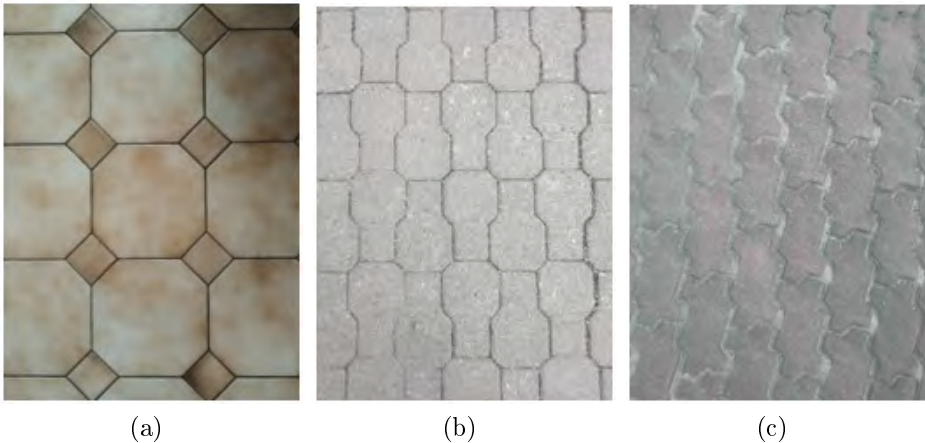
Examples of practical solutions in floor and pavement design, photo by E. Koźniewski: (a) floor tiles—styling of semi-regular tessellation  $x-y-z$ ; (b) parking lot paving –paver blocks "mirror", sidewalk designed according to  $p-q-r$  semi-regular tessellation; (c) sidewalk paving – paver blocks designed according to tessellation based on transformations on the square (combining the schemes from examples 2.2, 2.3 and gluing the two patterns)
